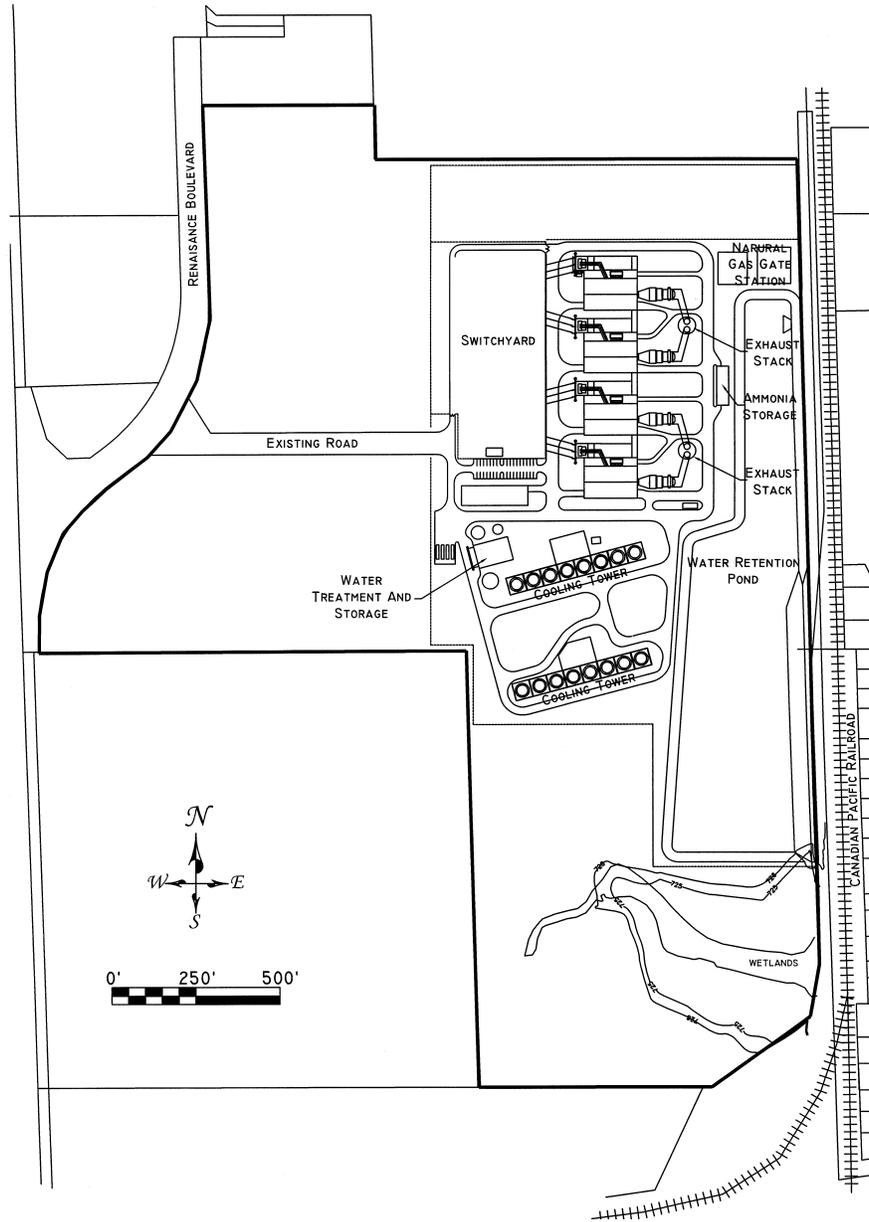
Expected layout for the proposed power plant at the Pleasant Prairie Site
